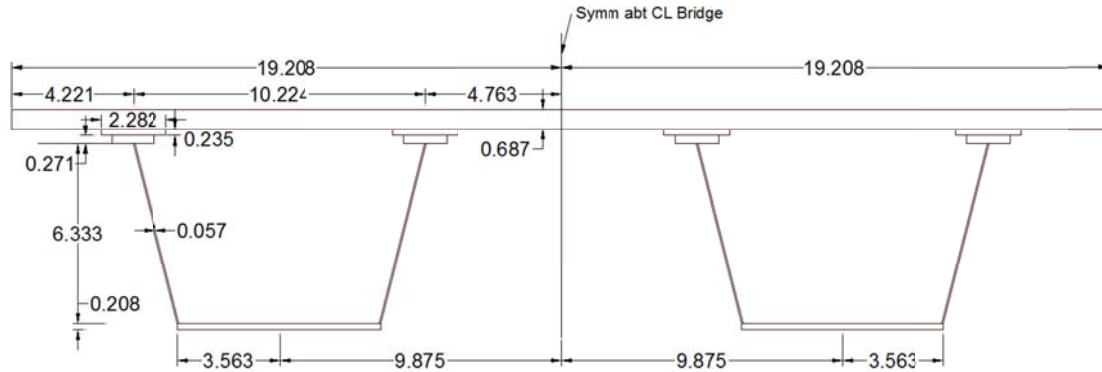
Typical steel BOX cross section (2) for L = 240ft at pier location
